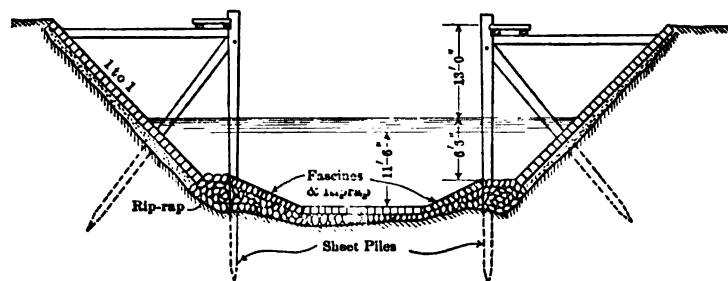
Section of a Lock Chamber with Paved Earth Slopes and Pile Fenders. (At Bollingerfähr, on the Dortmund-Ems Canal.)
